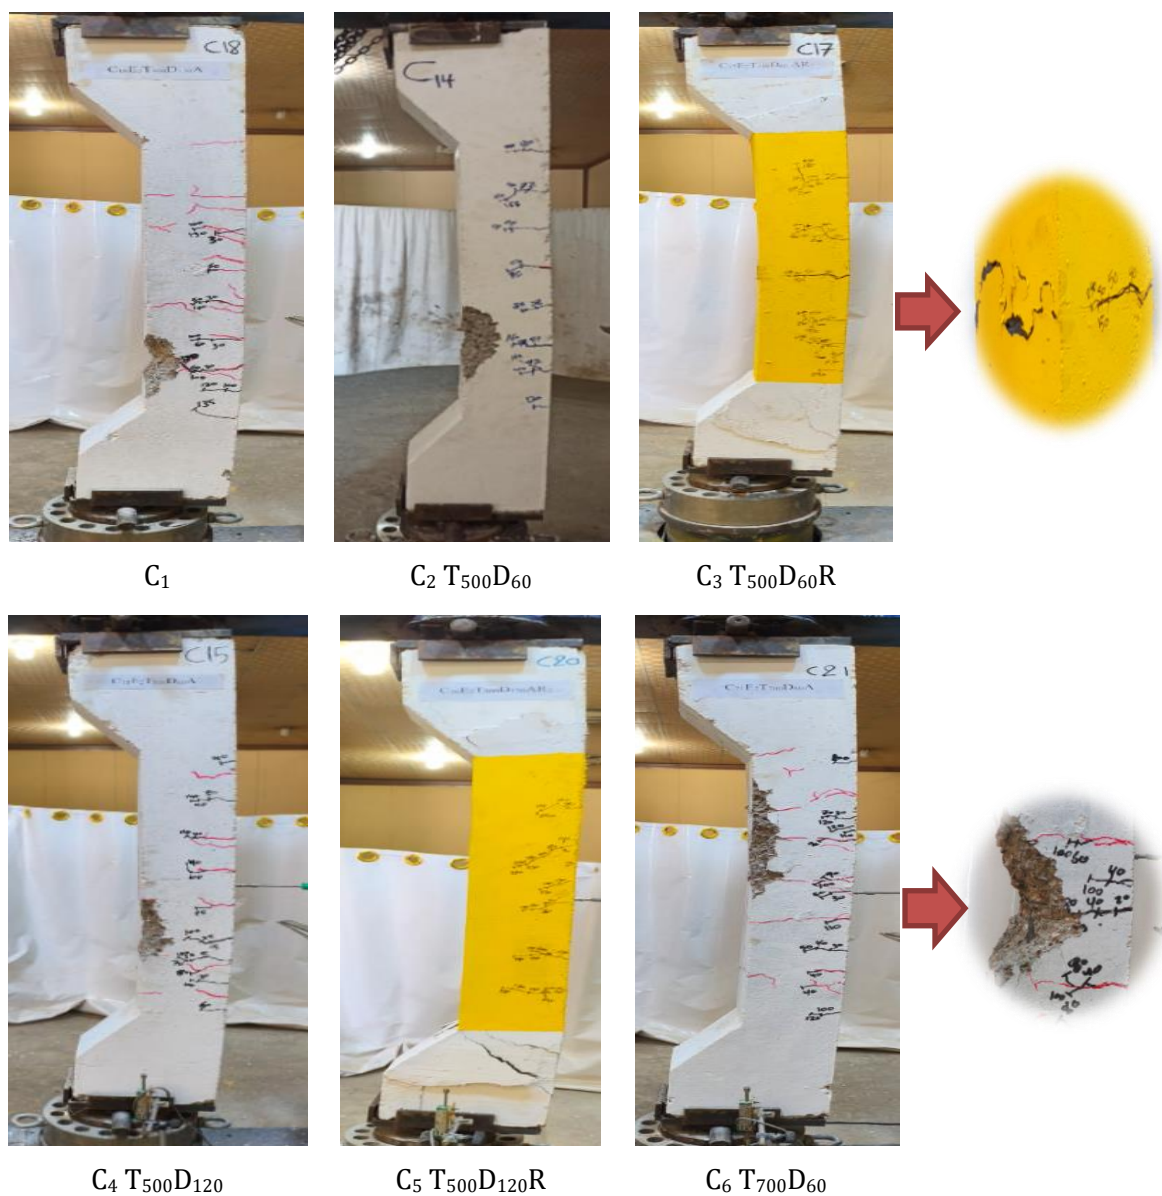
Spread of crack in specimens, (a) Column specimens without fire, (b) Column specimens with fire exposure and (c) Repaired column specimen
